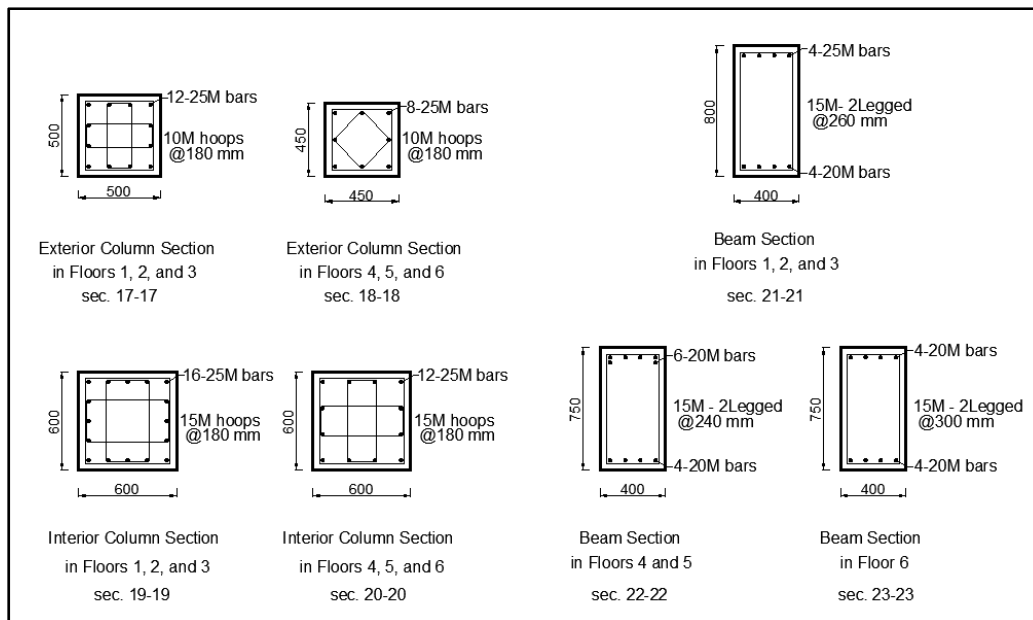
Reinforcing details of the conventionally constructed frames in Montreal
